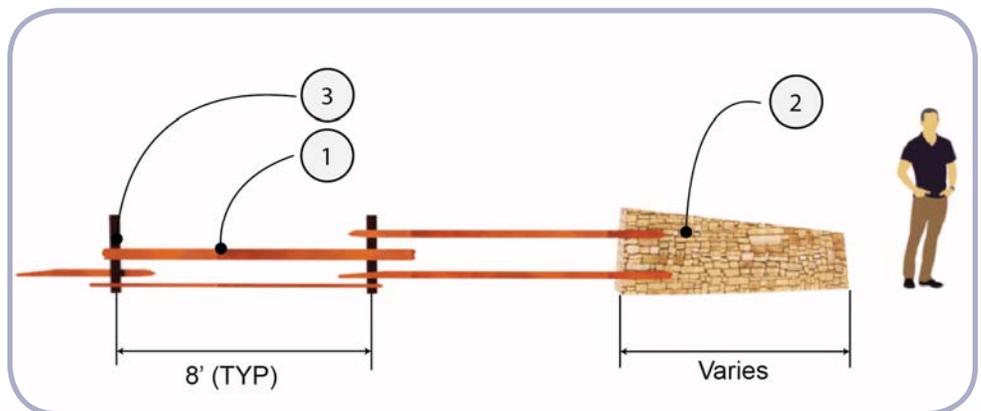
Example of Split Rail and Stone Veneer Accent Element
